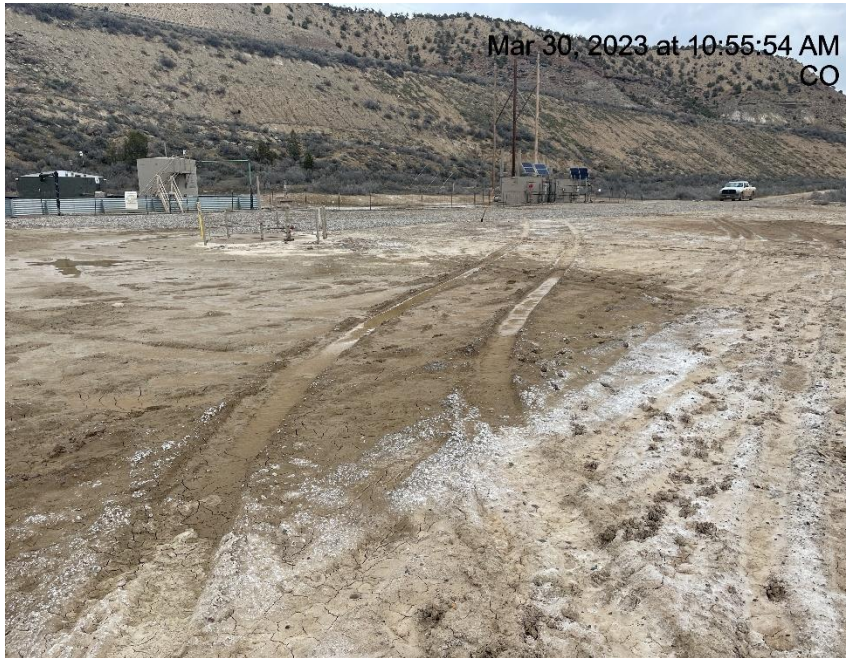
Lack of stabilization/Insufficient tracking BMP's on location
